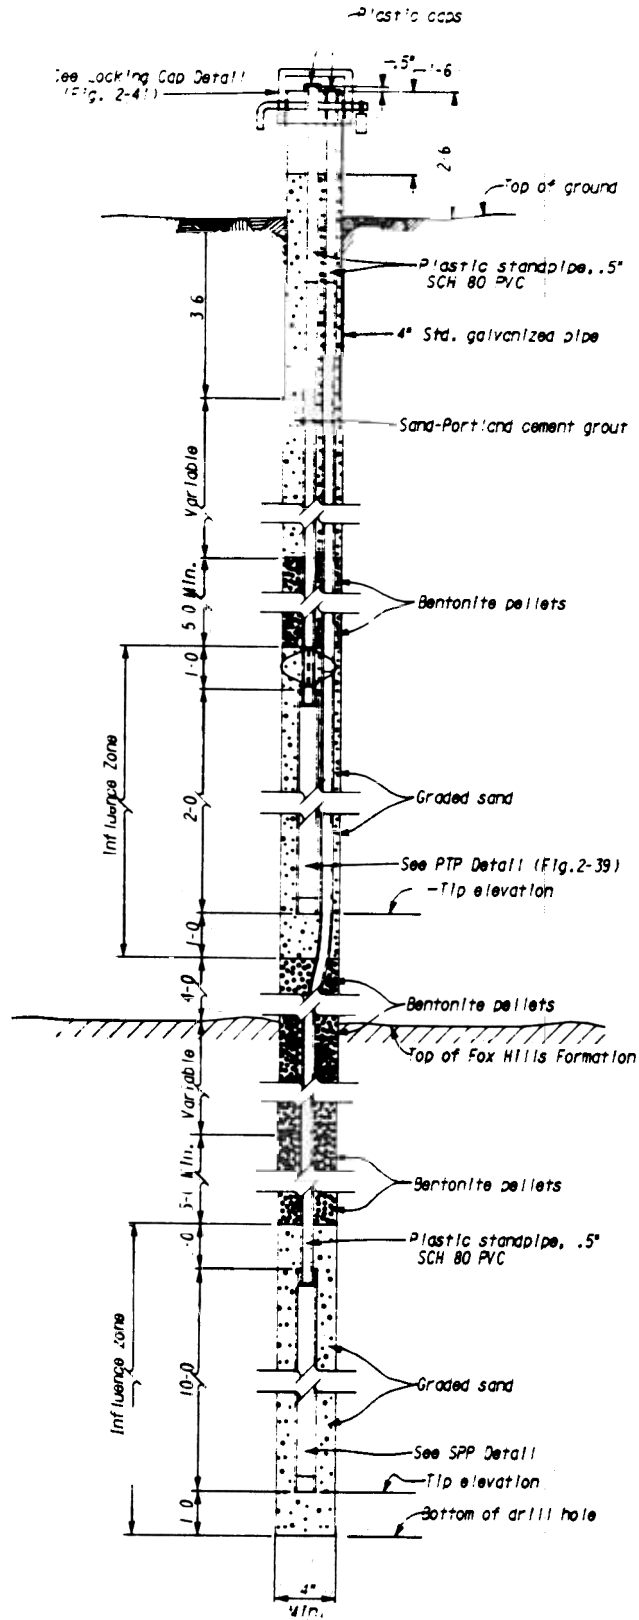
Installation details for porous-tube or slotted-pipe piezometer and for observation well.
